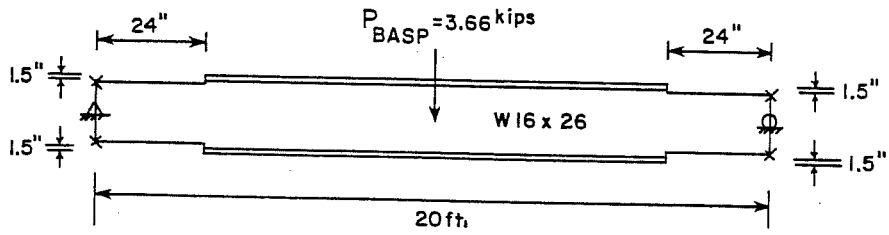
Buckled Shape of 24in. Double Flange Coped Beam
